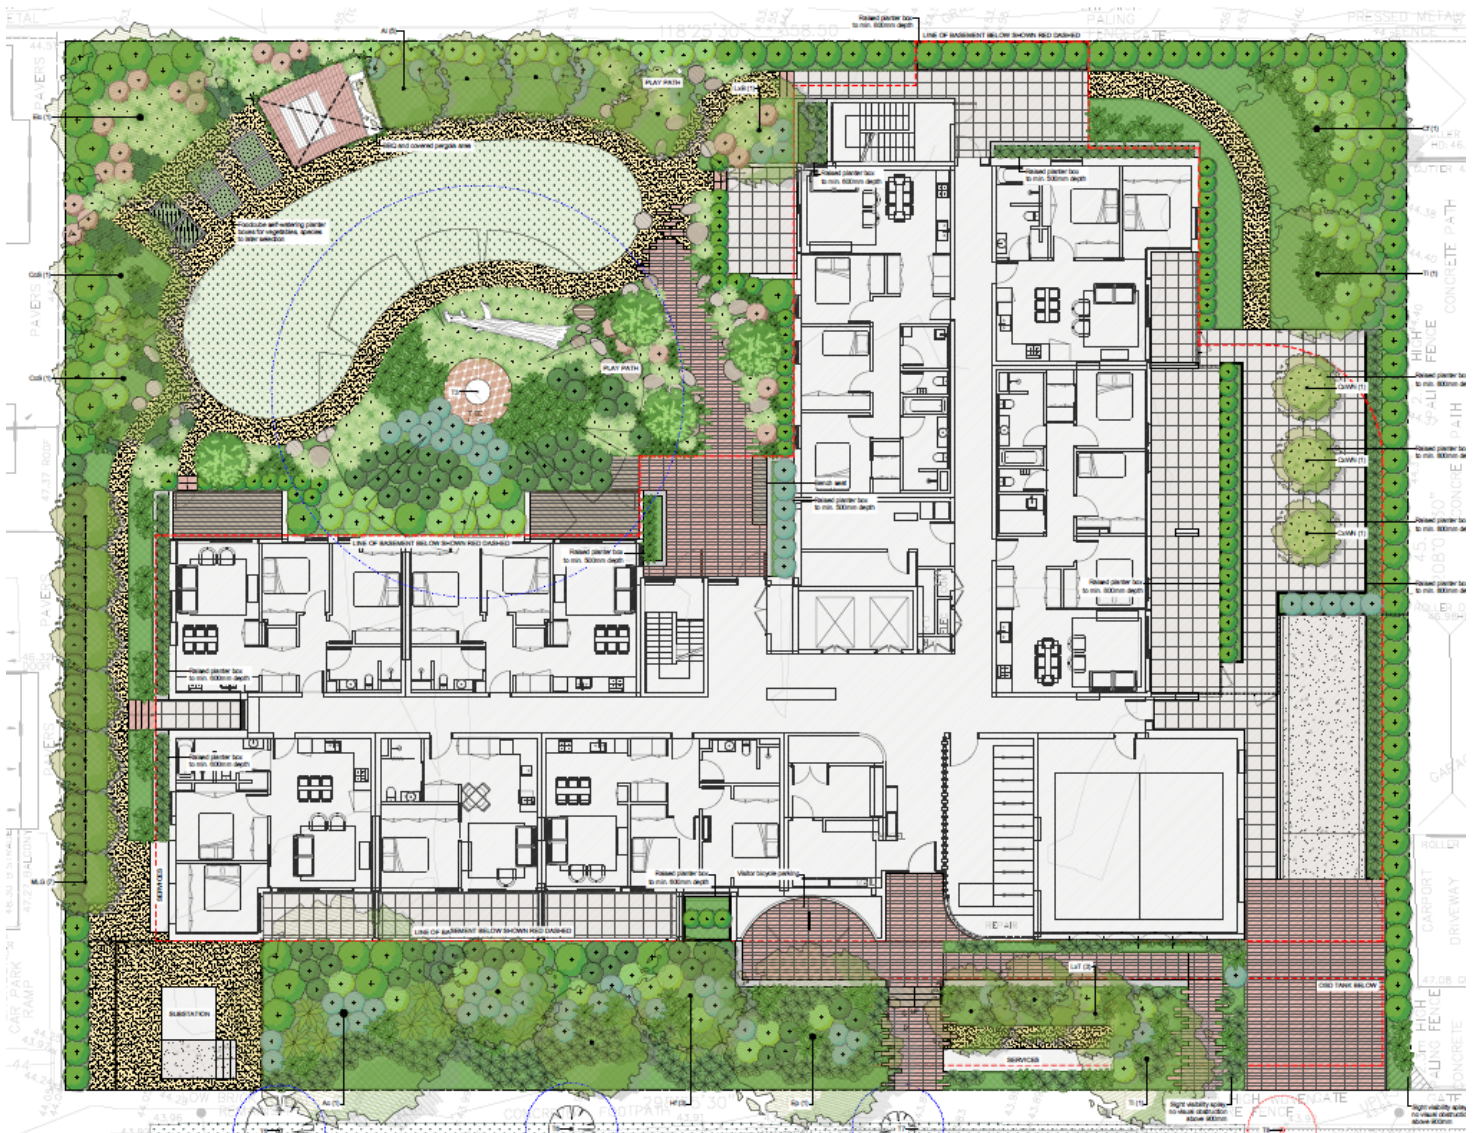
Extract of the landscape plan showing the key features of the development at the ground floor
